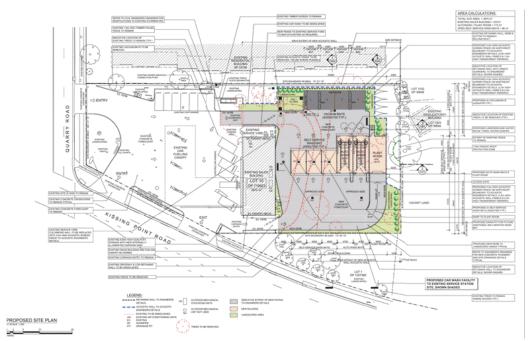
Proposed site plan by MCHP Architects dated 02/09/2020
